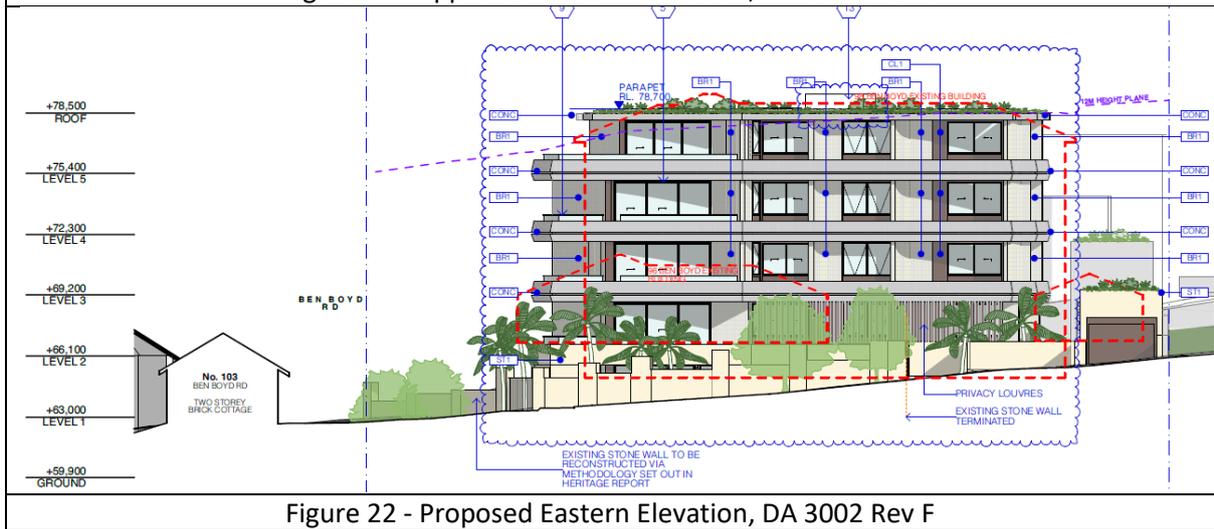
Proposed Eastern Elevation, DA 3002 Rev F
